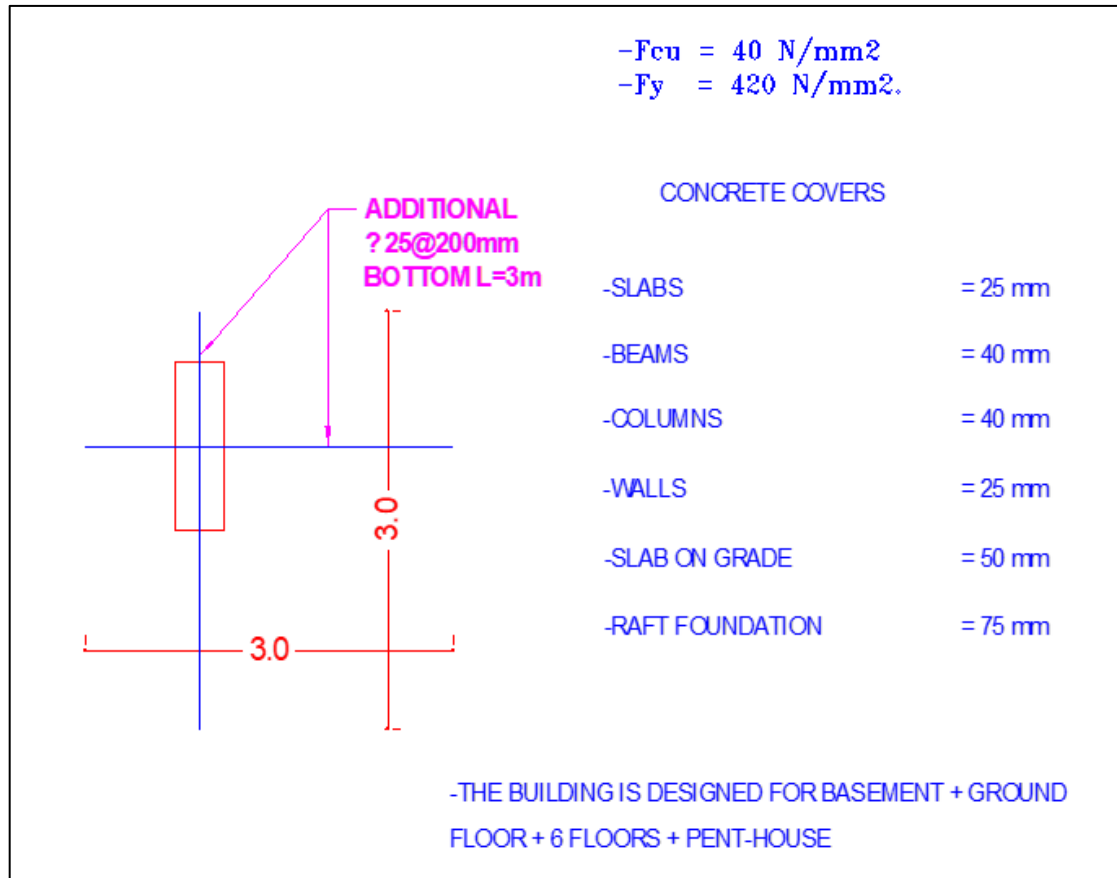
The Optimum Thickness of Concrete Covers Required in the Construction Project.
